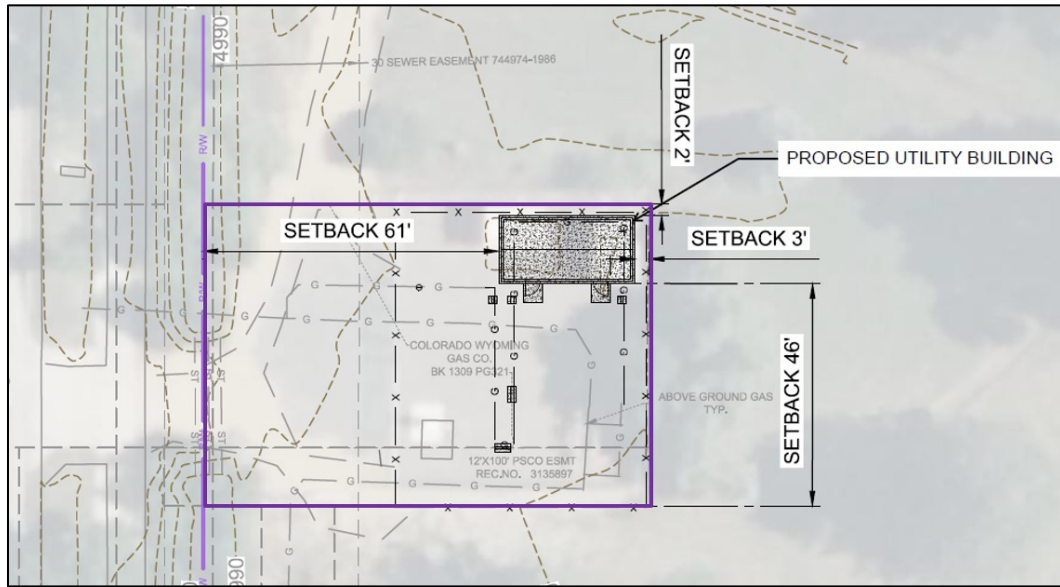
Site plan with proposed utility structure; the parcel lines are indicated in purple.
